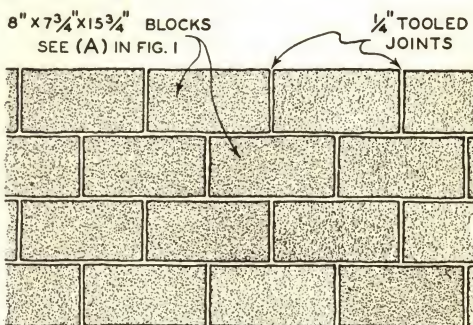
Common Concrete Block Wall Built of 8" x 8" x 16" Units
